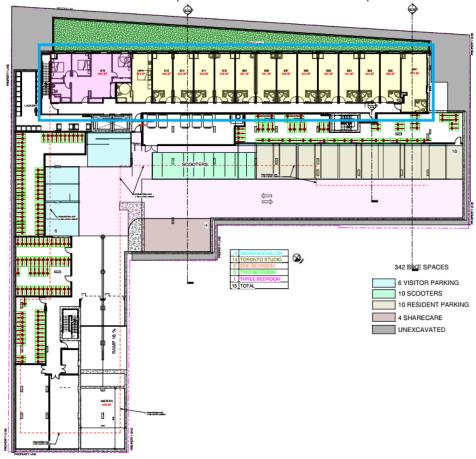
112 Nelson Basement Floor Plan (apartment units outlined)
